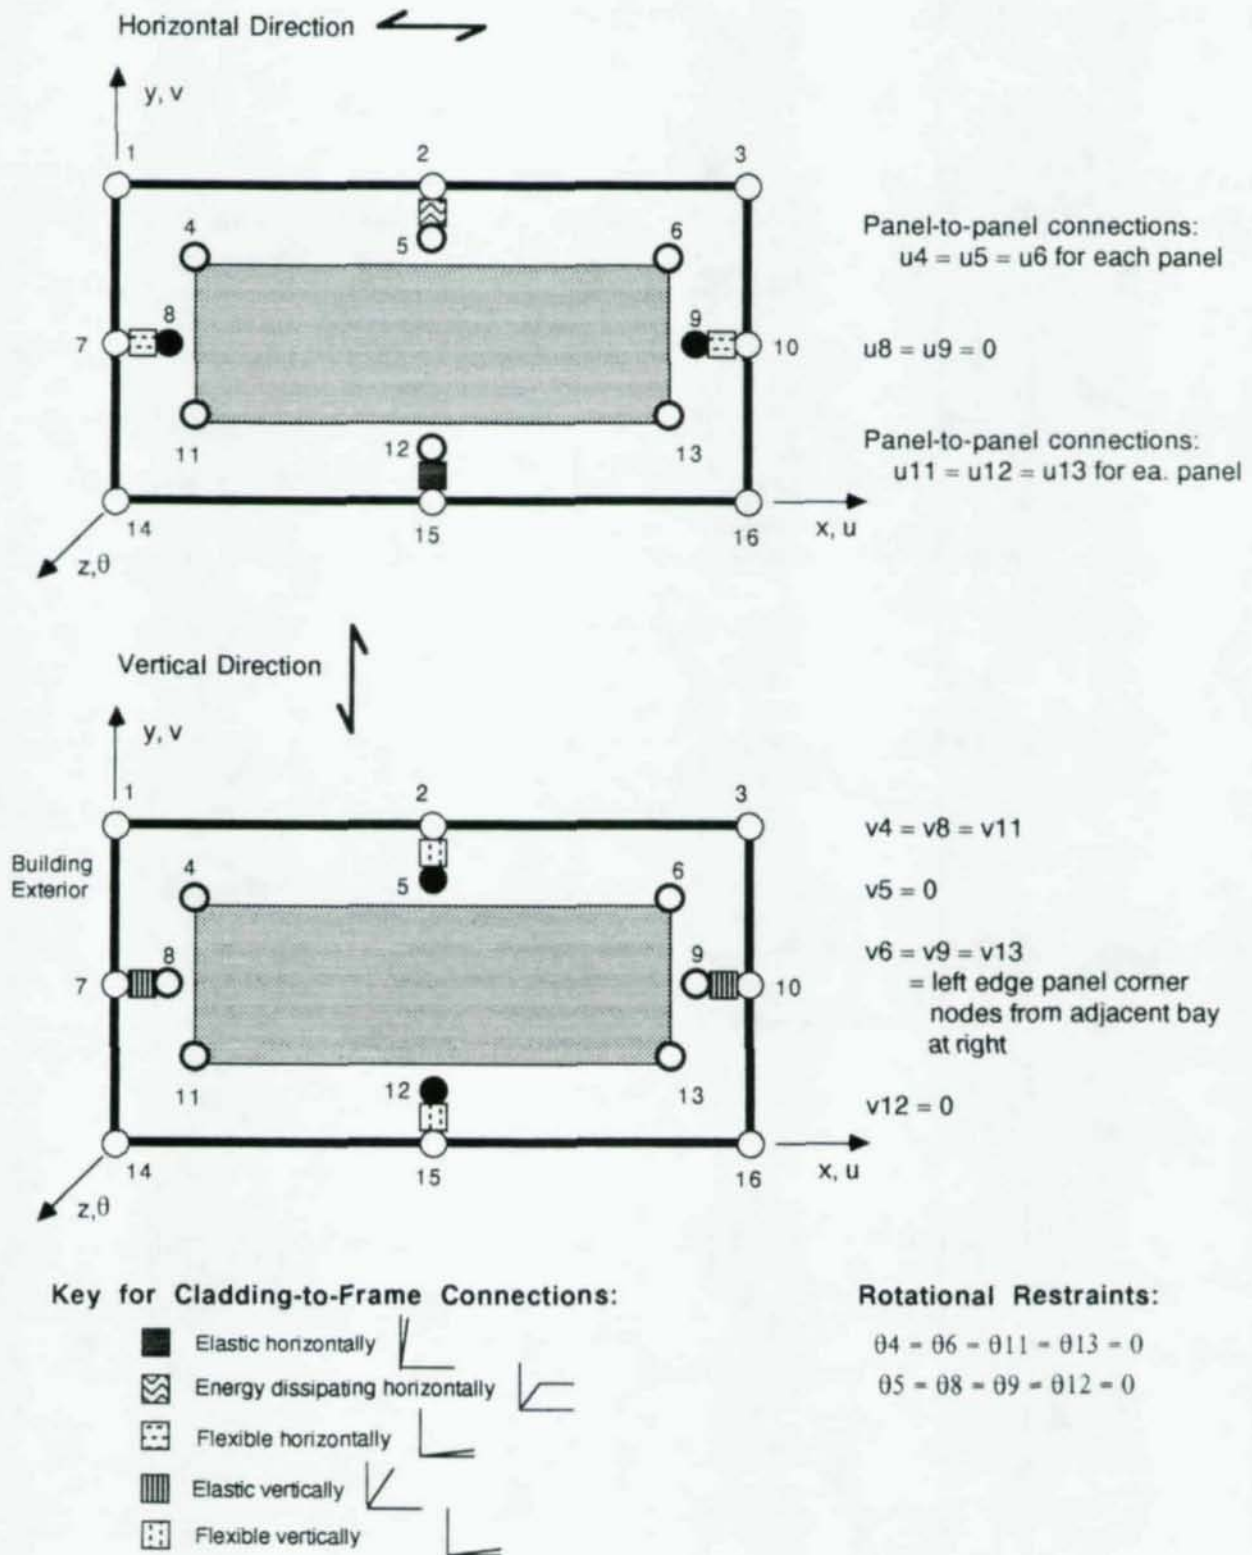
Typical Bay: Restraint and Constraint of Nodes
